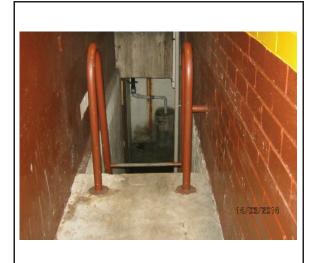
Sump pump room located on lower basement car park at 37 Pitt Street
